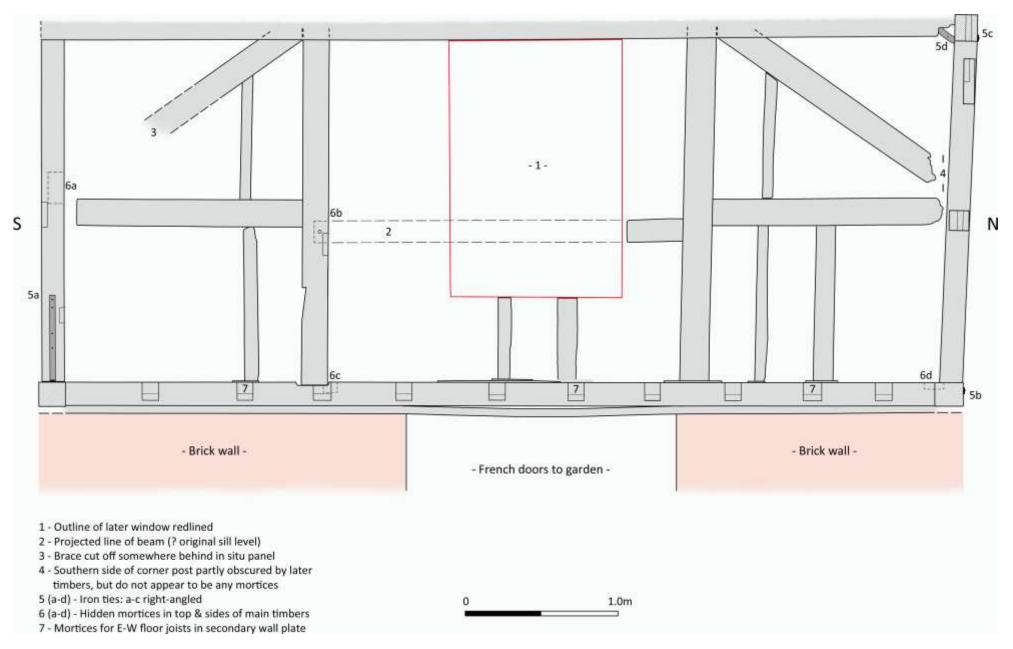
A simplified elevation of the western wall, showing the surviving original timbers (with limewash covering) and principal elements of repair – the basal or girding beam and the northern corner post
